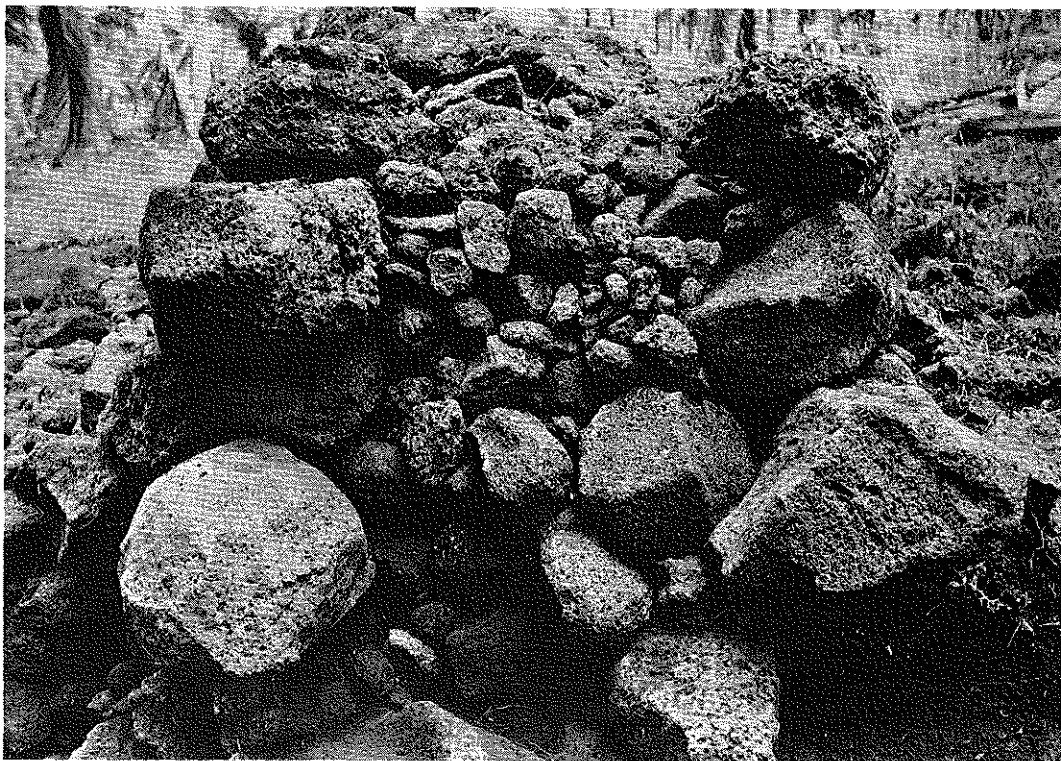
CROSS SECTION OF STONE WALL OF WALLED WALKWAY. Showing outer courses of large fitted stones and smaller stone rubble fill.
